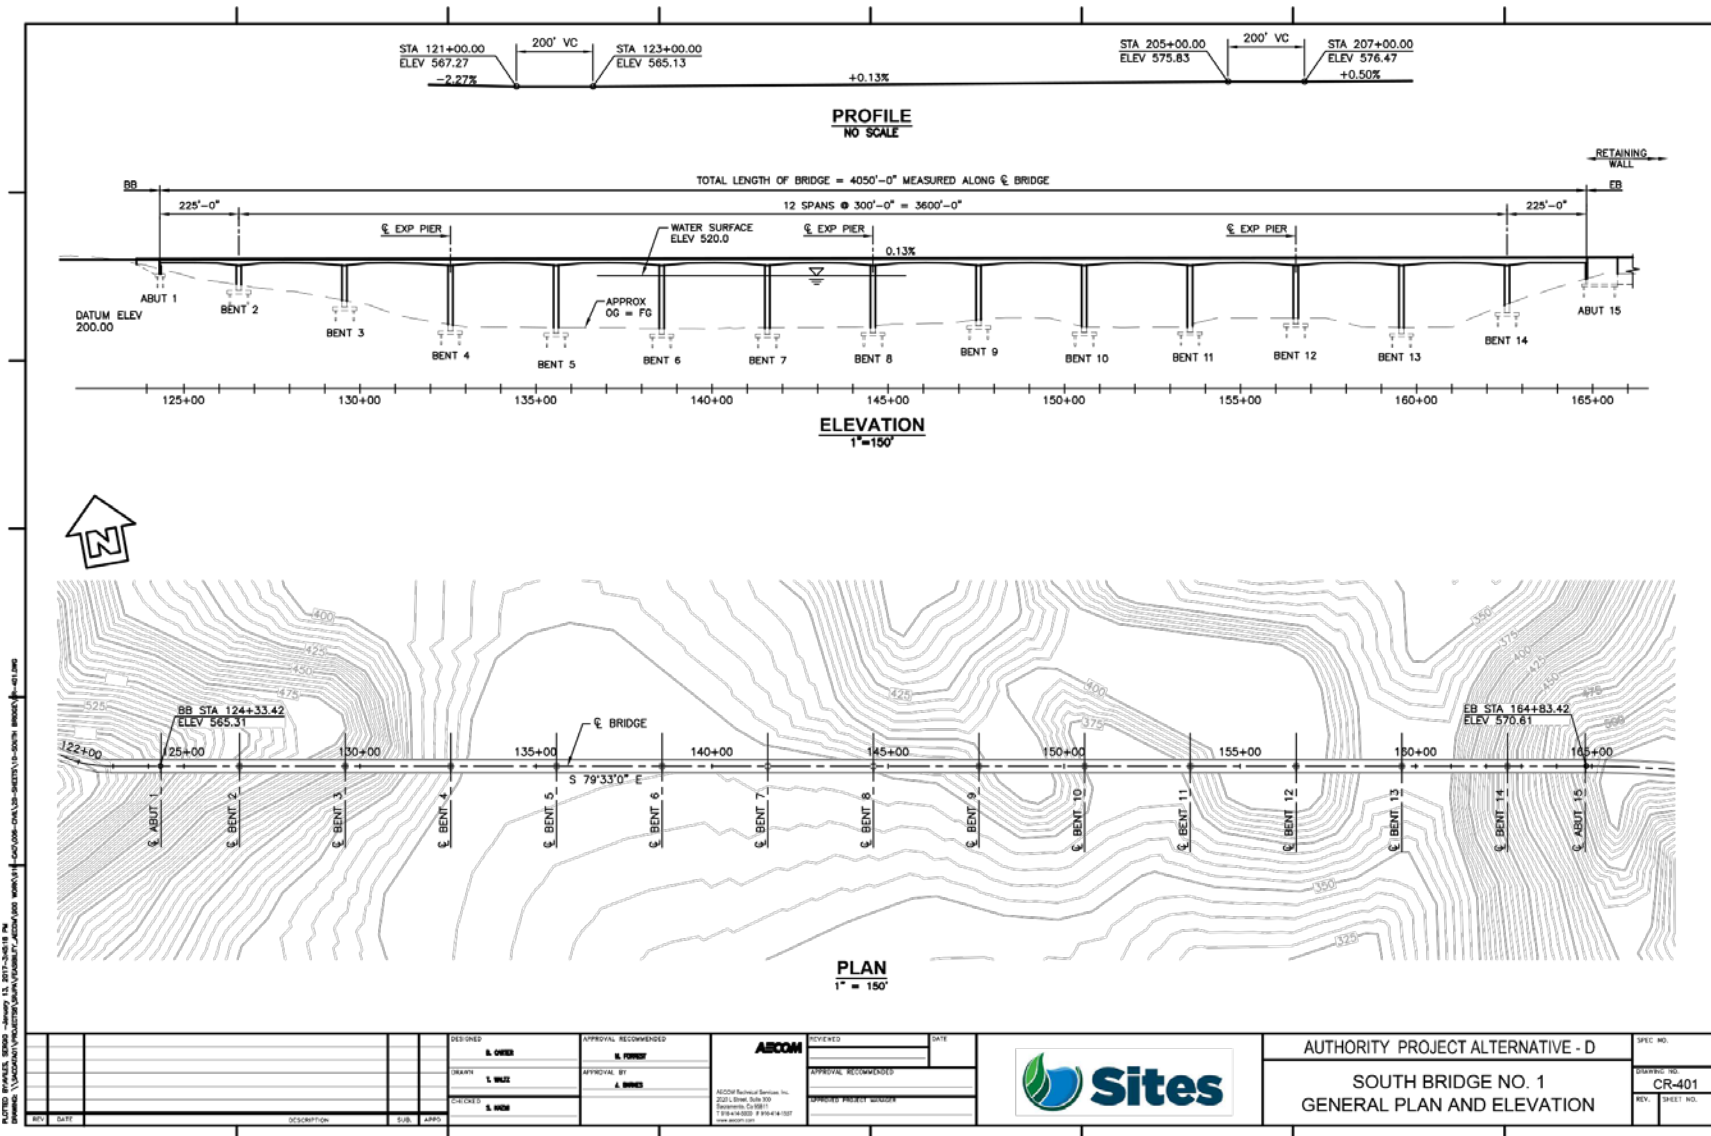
South Bridge Plan and Profile, Sheet 1
